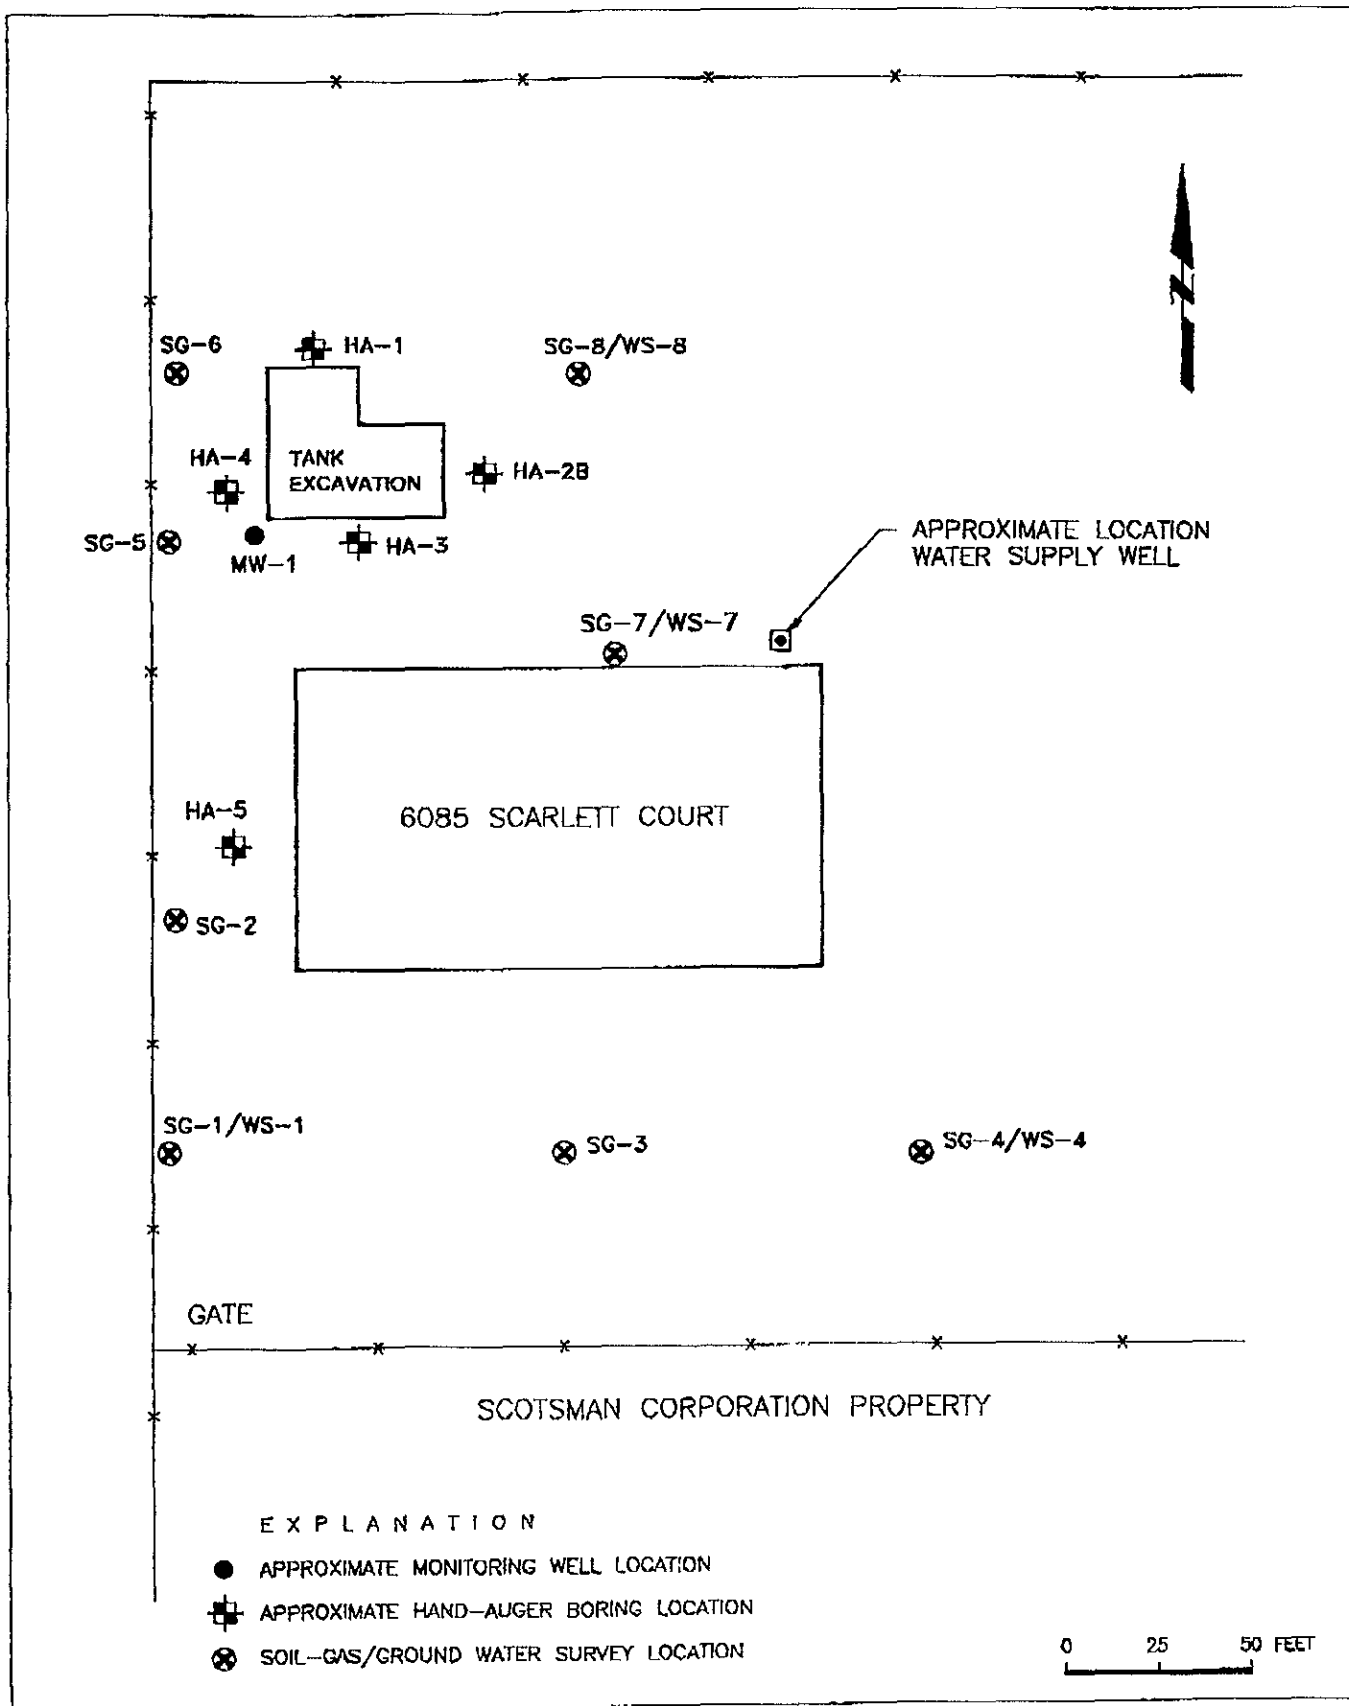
SITE PLAN SHOWING HAND-AUGER BORING AND SOIL-GAS/
